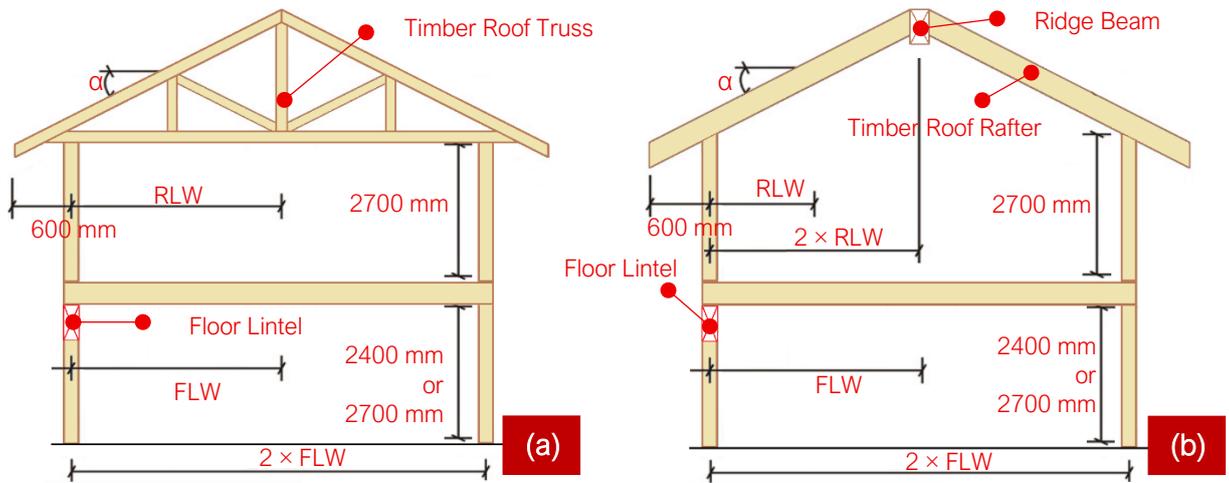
Red Stag Vertix₁₀ floor lintel beam; a) Timber roof truss, b) Timber roof rafter.
